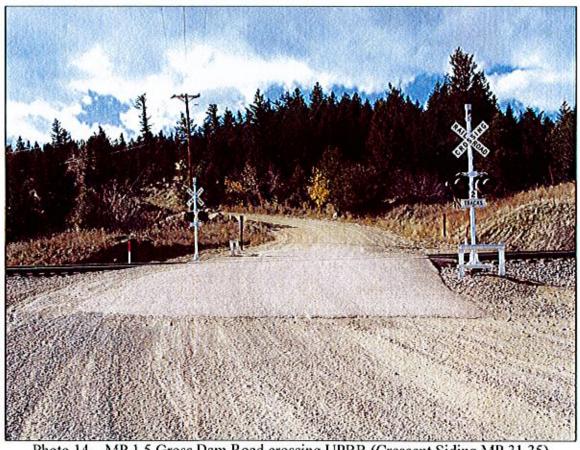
MP 1.5 Gross Dam Road crossing UPRR (Crescent Siding MP 31.35)
